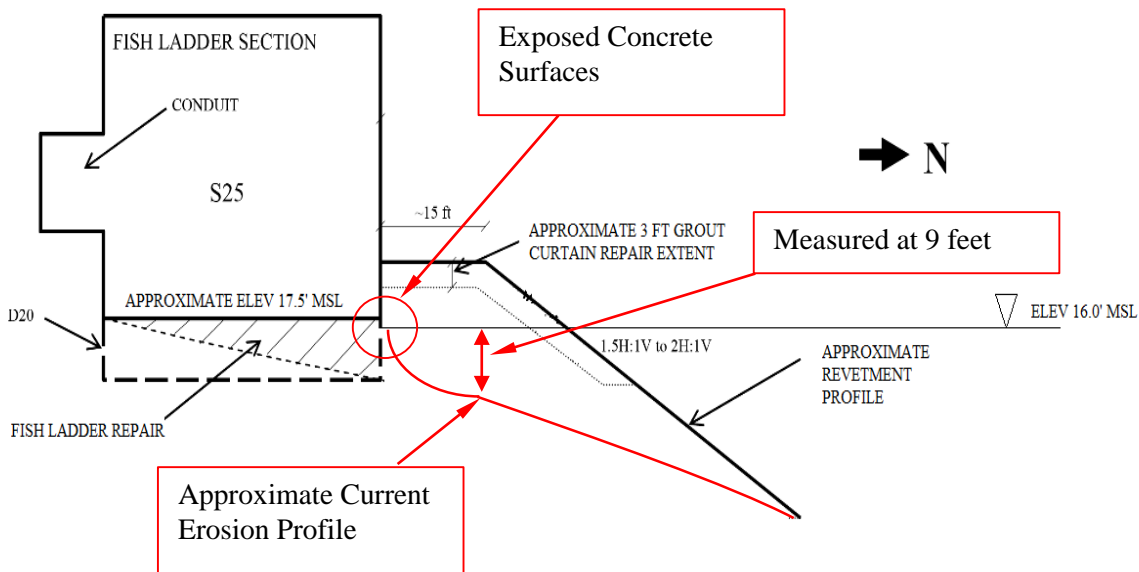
Bonneville B-Branch Fish Ladder Erosion Cross Section at Section 25-26 Joint
